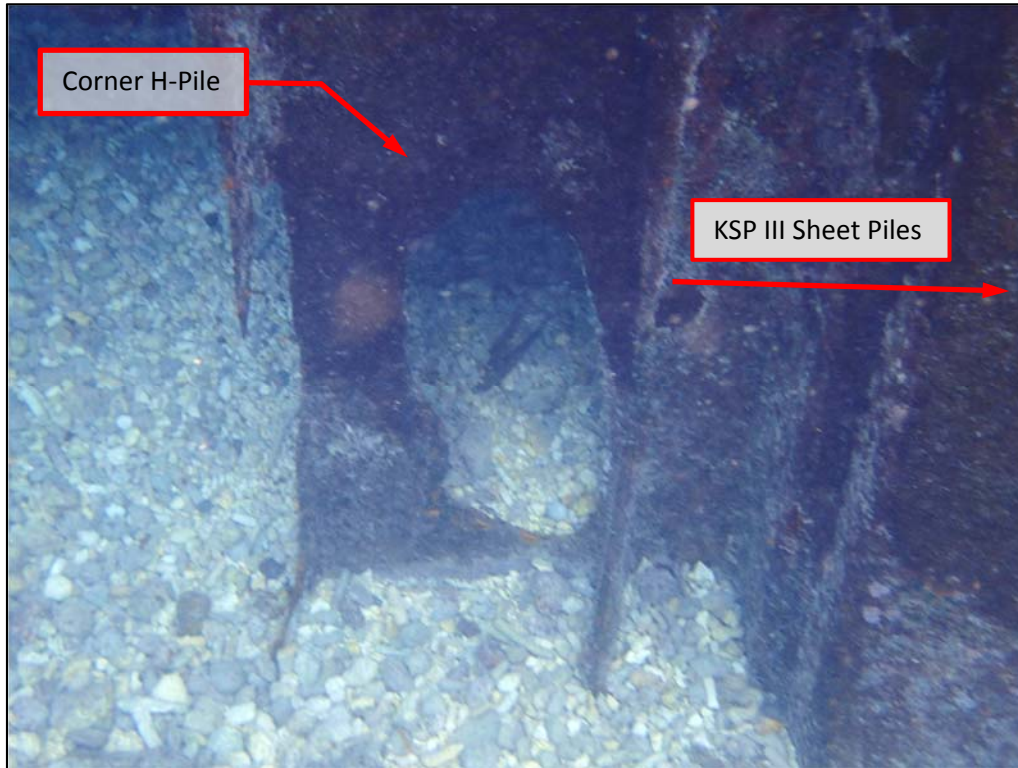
Berth 1. The corner H-pile and KSP III sheet piles connection. See Figure 4 for detail.
